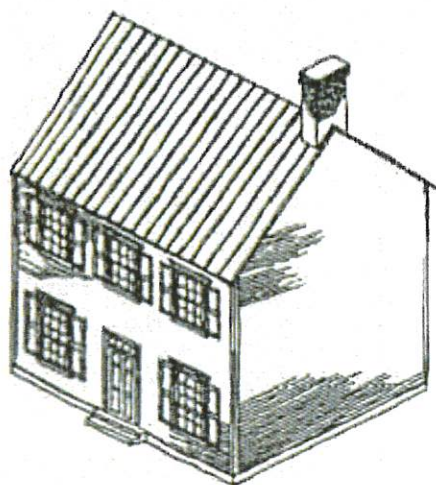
Orthogonal view of Period I building in New Market (c 1790-1835). Period I structures are characterized by their side gable roof form, flush end wall chimneys, two story height, double hung sash Windows, and classical detailing.
